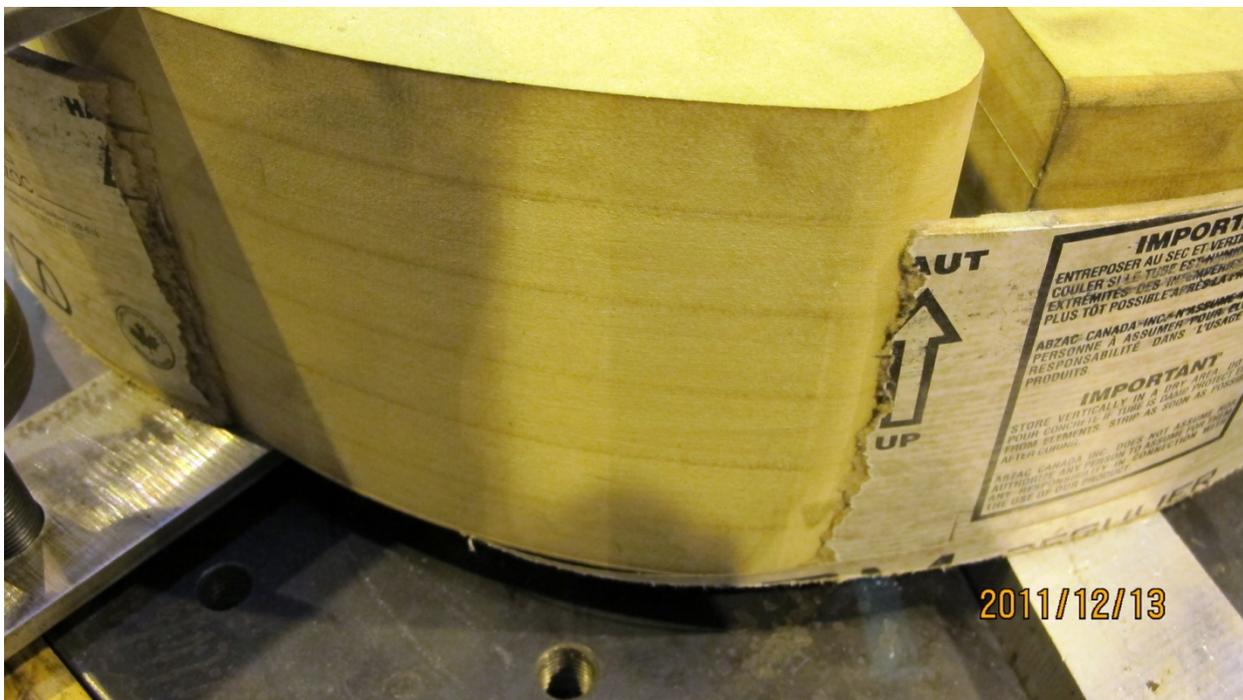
Typical sample deformation under loading, 1/2 inch thick sample shown
